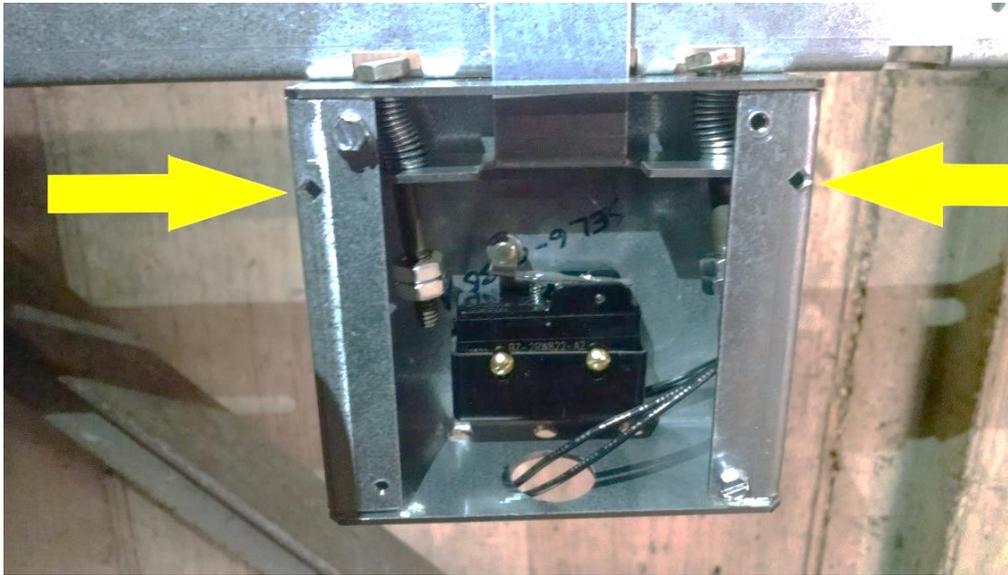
Lower Bracket with Springs Properly Compressed to the Marks
